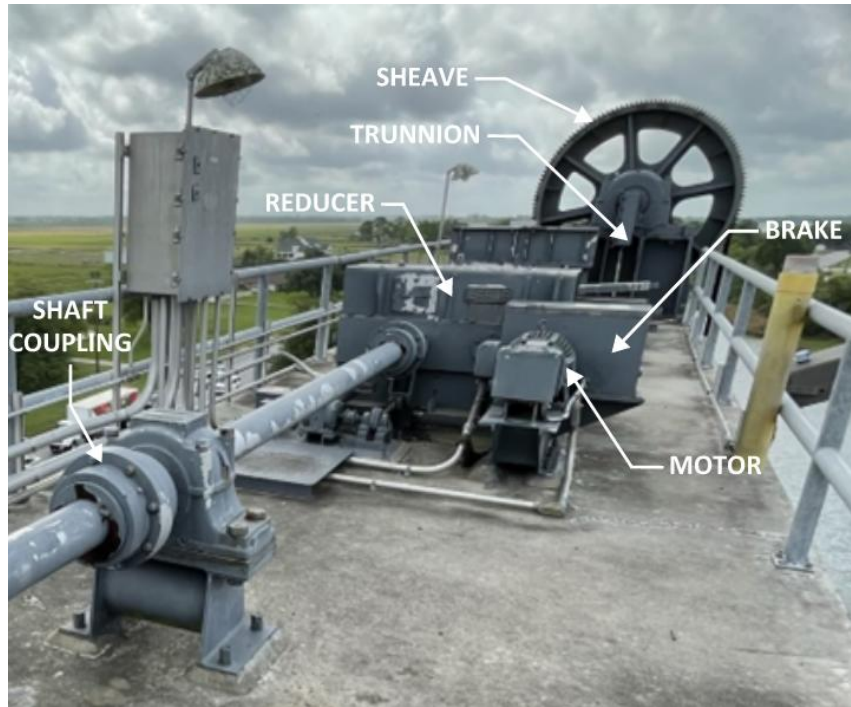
Tower drive vertical lift bridge operating machinery layout.
